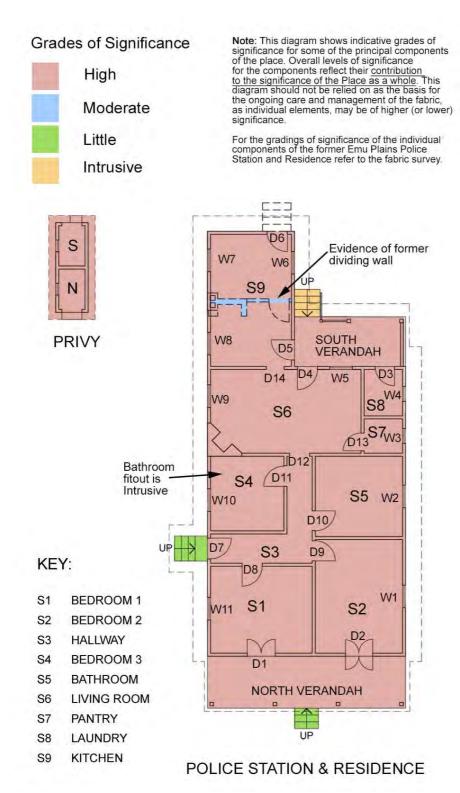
14: Floor plans of Emu Police Station and Residence and Privy showing indicative gradings of significance.
